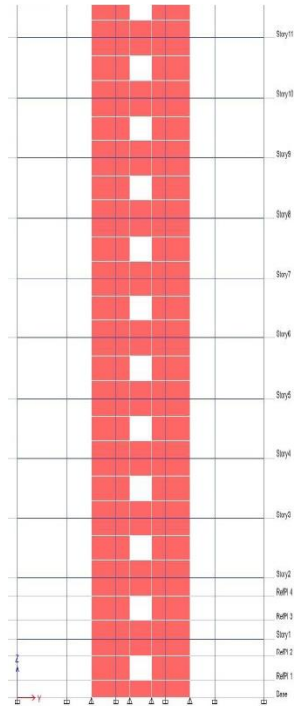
Side view showing shear wall openings of size 2 m X 1.2 m
